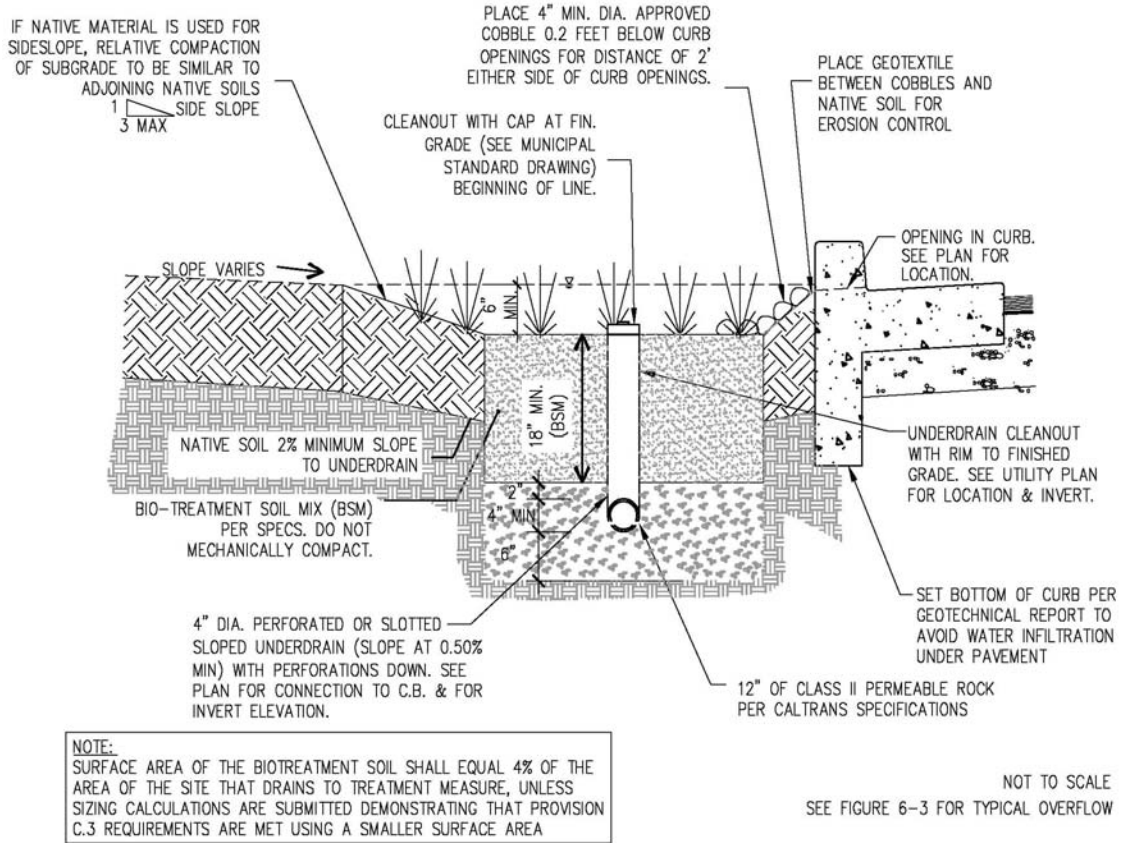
Cross section of bioretention area showing inlet from pavement.
